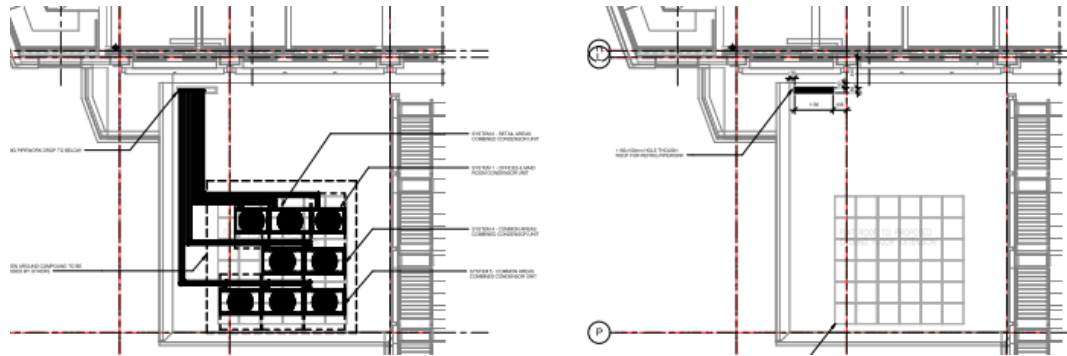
Proposed Roof-top Plant Plan Layout.
